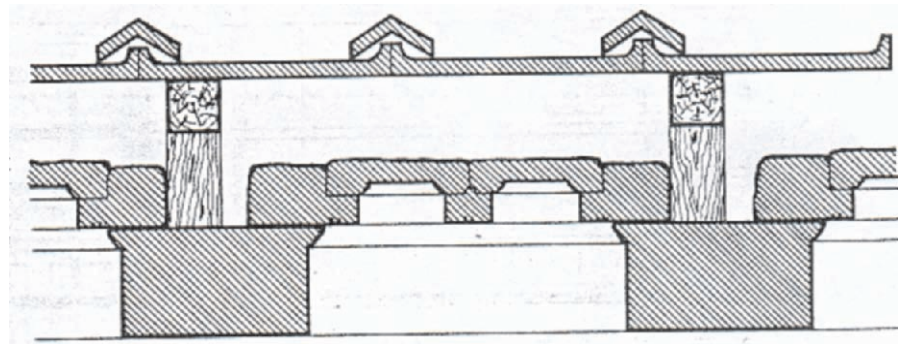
Temple of Nemesis. Cross section through the front porch, showing unreinforced ceiling beams and coffer slabs<sup>13</sup>.
